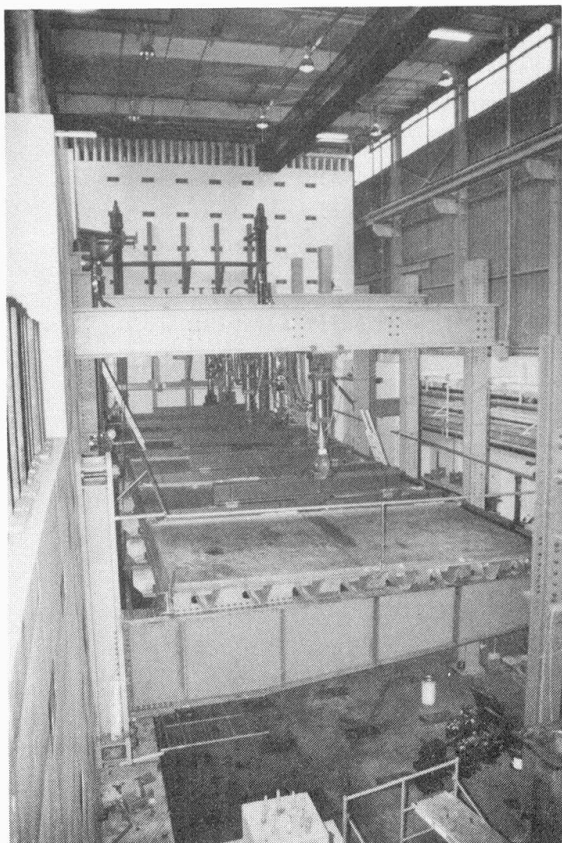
Full-scale fatigue test of a cantilevered section of an orthotropic deck.
